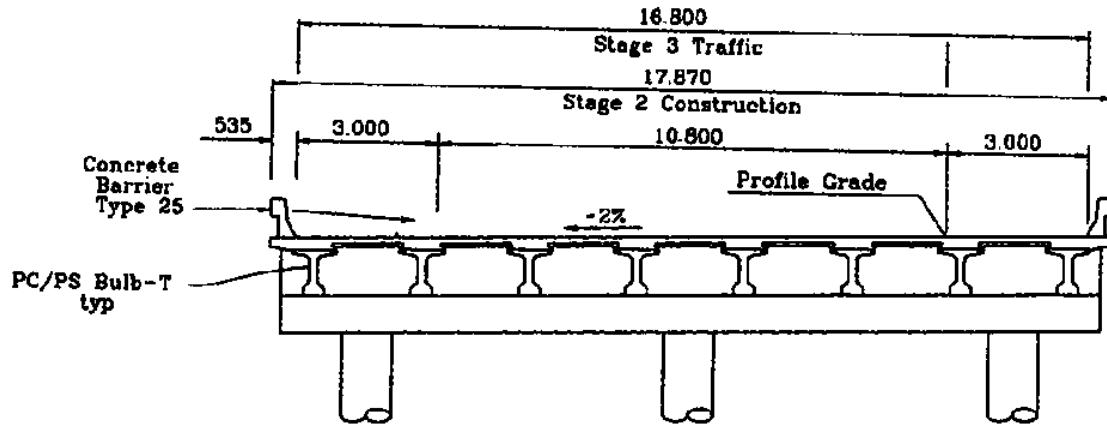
Typical section of the bridge added during the San Mateo-Hayward Bridge widening project (PCI Journal).
